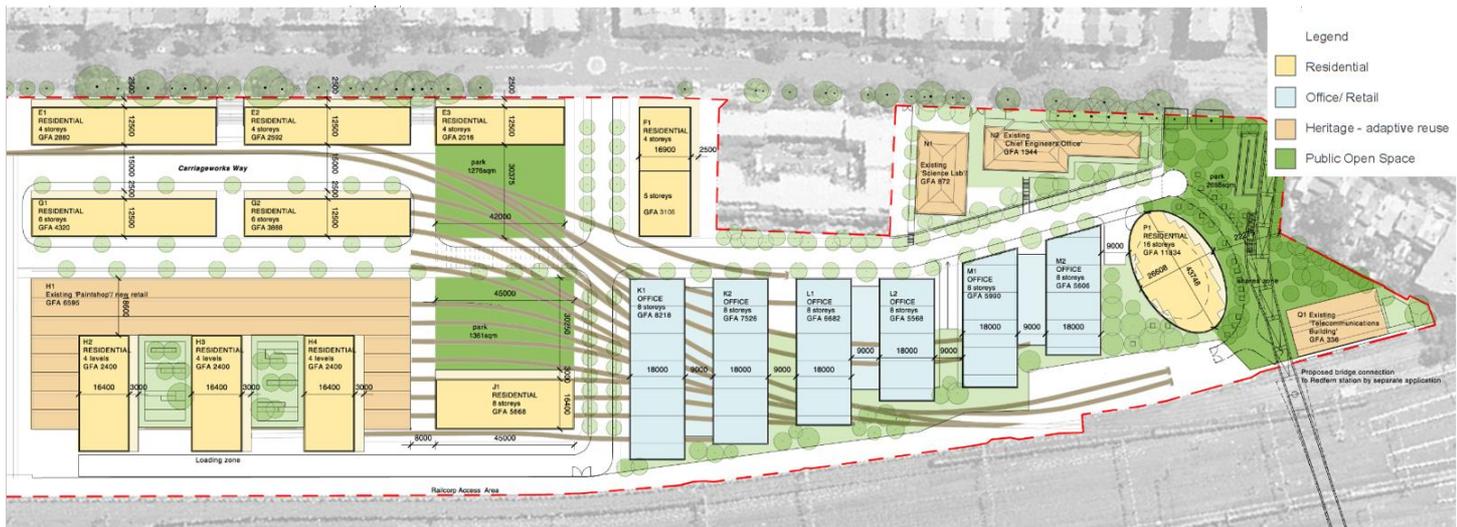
Concept Plan Land Use (Bates Smart 2008)
